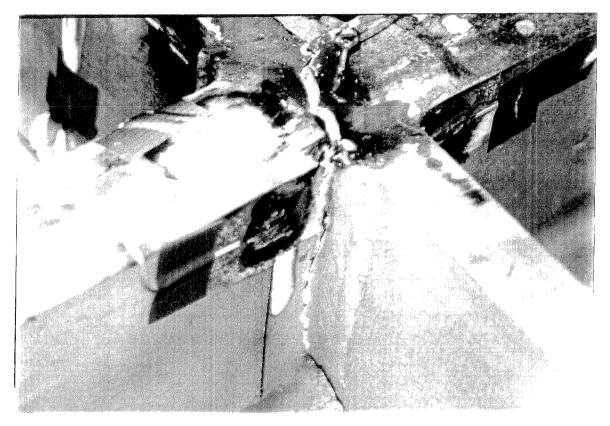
PHOTOGRAPH SHOWING FRACTURE OF SPECIMEN ADP3 (COLUMN WEB OUTSIDE PANEL ZONE)
